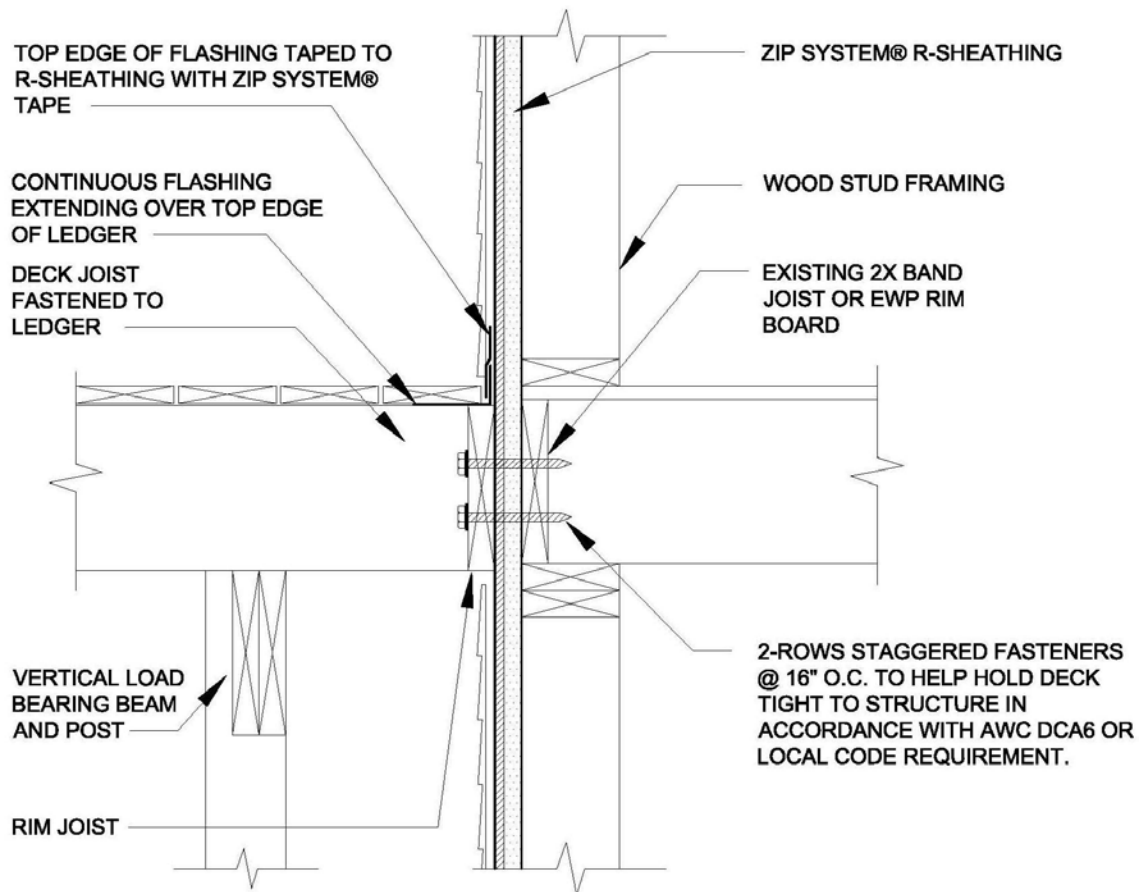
Self-supporting Deck Fastened to R-Sheathing Wall Assembly
